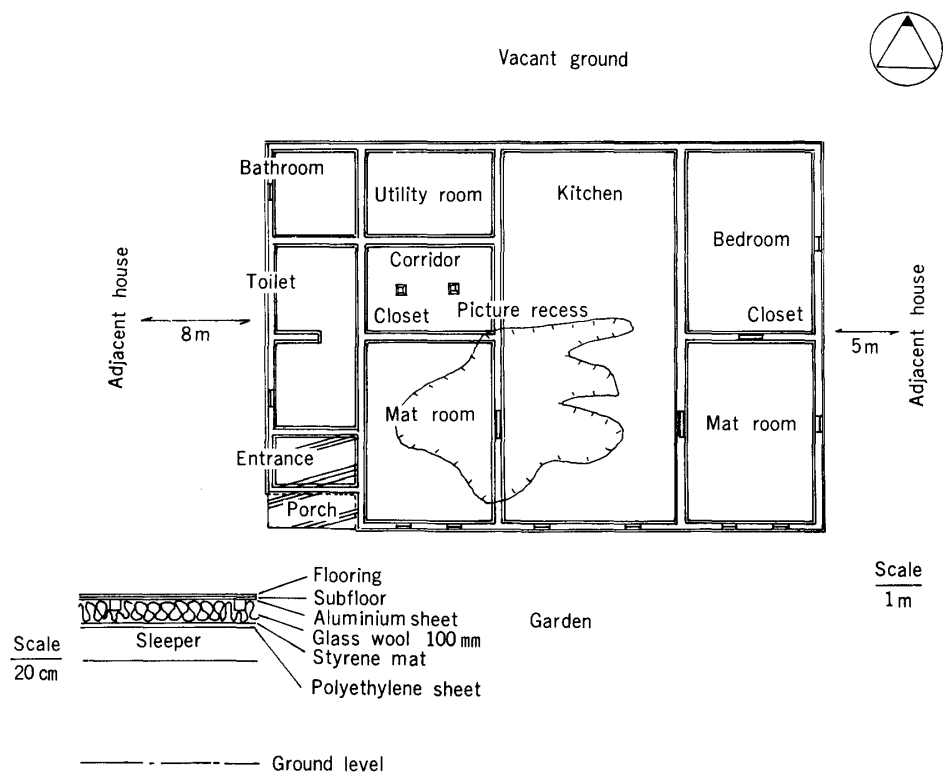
The foundation plan and the details of the floor constitution (Case 6).
